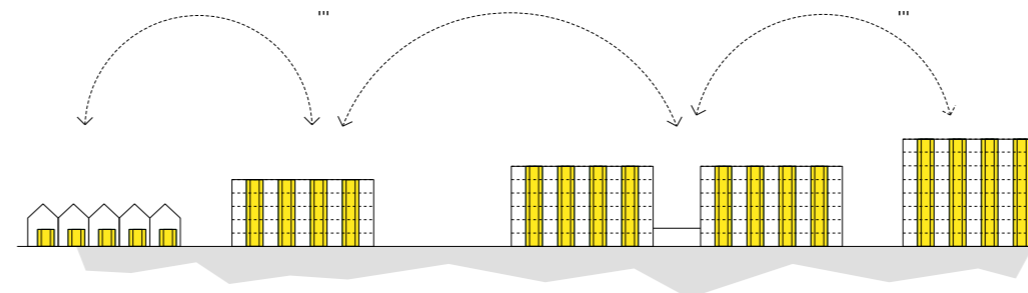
Building B - Piper Road continuing the language of bay windows and a castellated facade.
